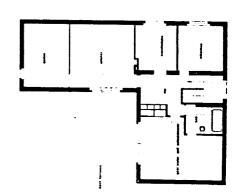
"Siedlung Dessau-Toerten", 1925-28 fig. 2 Typical Floor Plan 1928 fig. 3 Fotogarphy from Street
